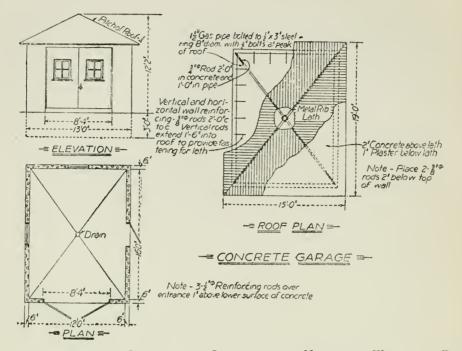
DESIGN FOR A GARAGE TO BE CONSTRUCTED OF MONOLITHIC WALLS AND ROOF CONSTRUCTION OF METAL LATH WITH CONCRETE ABOVE AND CEMENT PLASTER BELOW.
